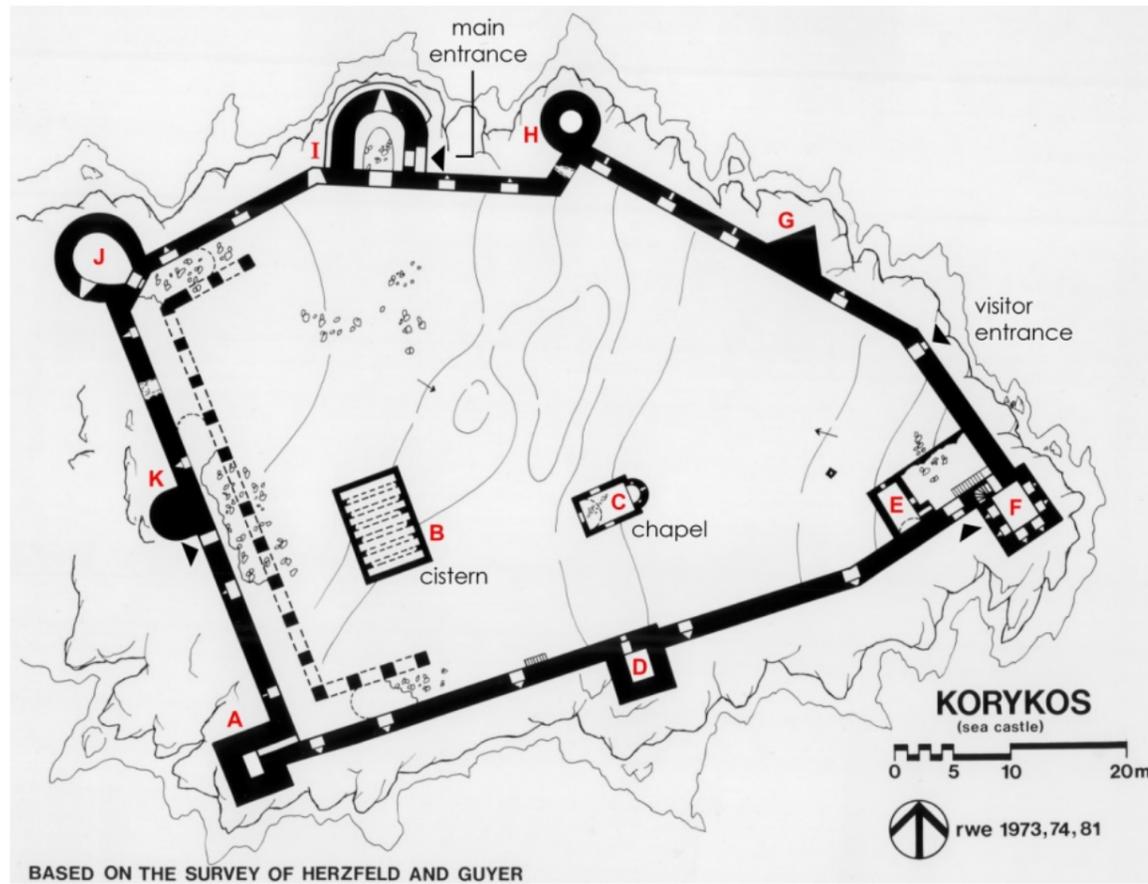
Ground floor plan of the castle drawn by Edwards
